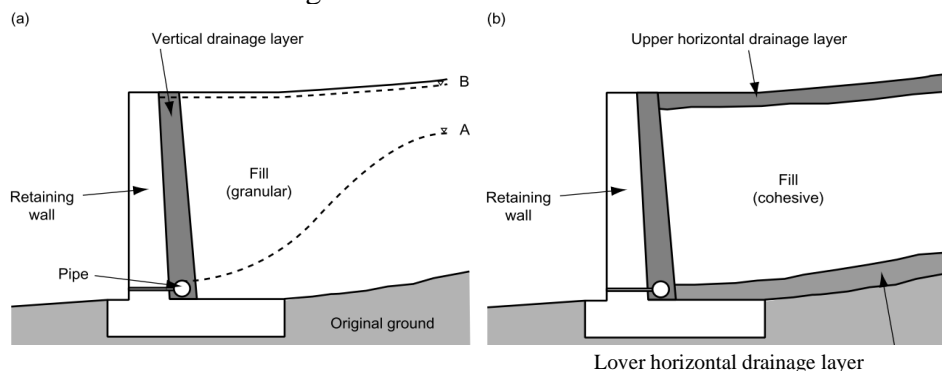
Schematically view of typical retaining wall structures: (a) a wall backfilled with granular resulting in vertical drainage, (b) a wall backfilled with fines resulting in horizontal drainage [2]
